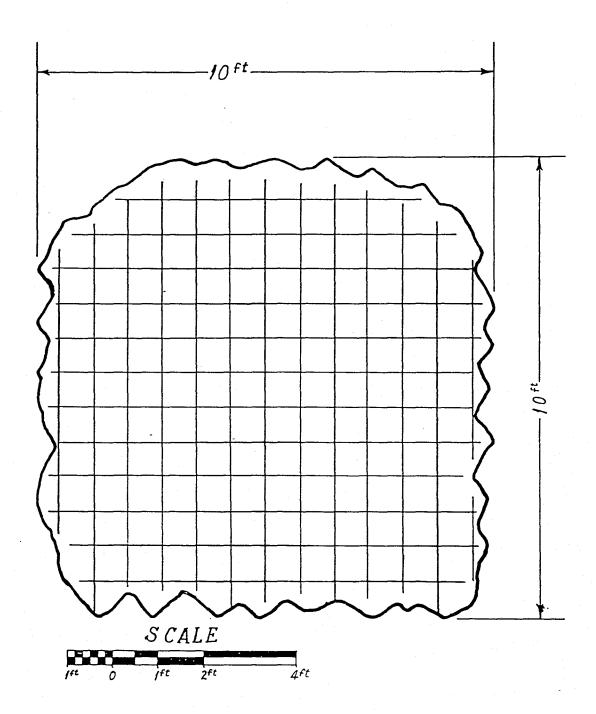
Air-side rebar cage (mat) for flexural reinforcement in the F-Level Brenneman/Sunnyside Connection, #10 bars, 9-in. spacing, 3.5-in. minimum depth of cover.
